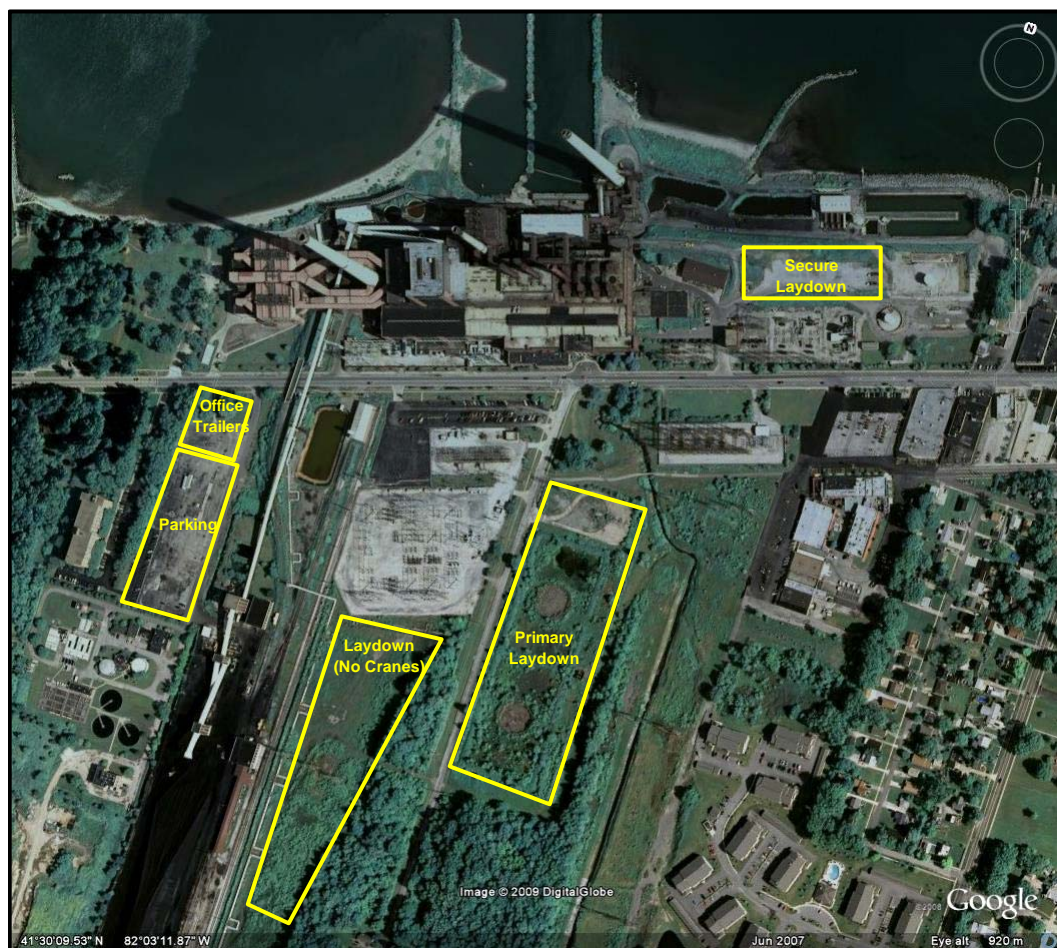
Construction laydown areas, parking and office trailer locations.
